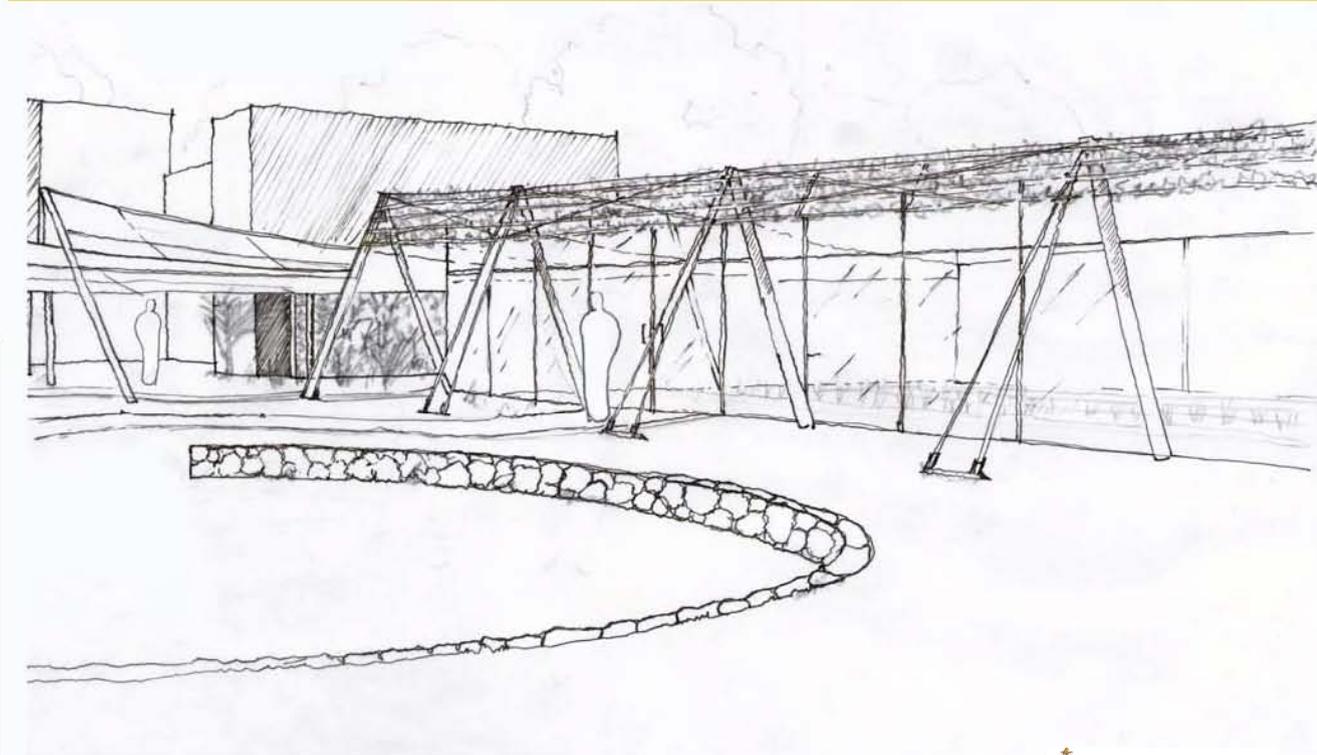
View from visitor's footpath towards glasshouse. Vegetation can be grown onto cables used as essential facade shading- August 2008
